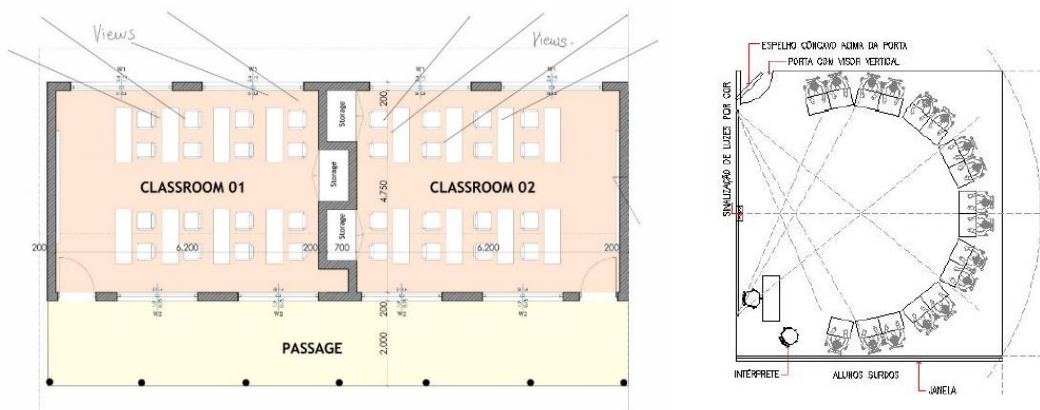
a) typical layout of a classroom in the school. b) Classroom layout in circle form. (Martins and Gaudiot 2012)
